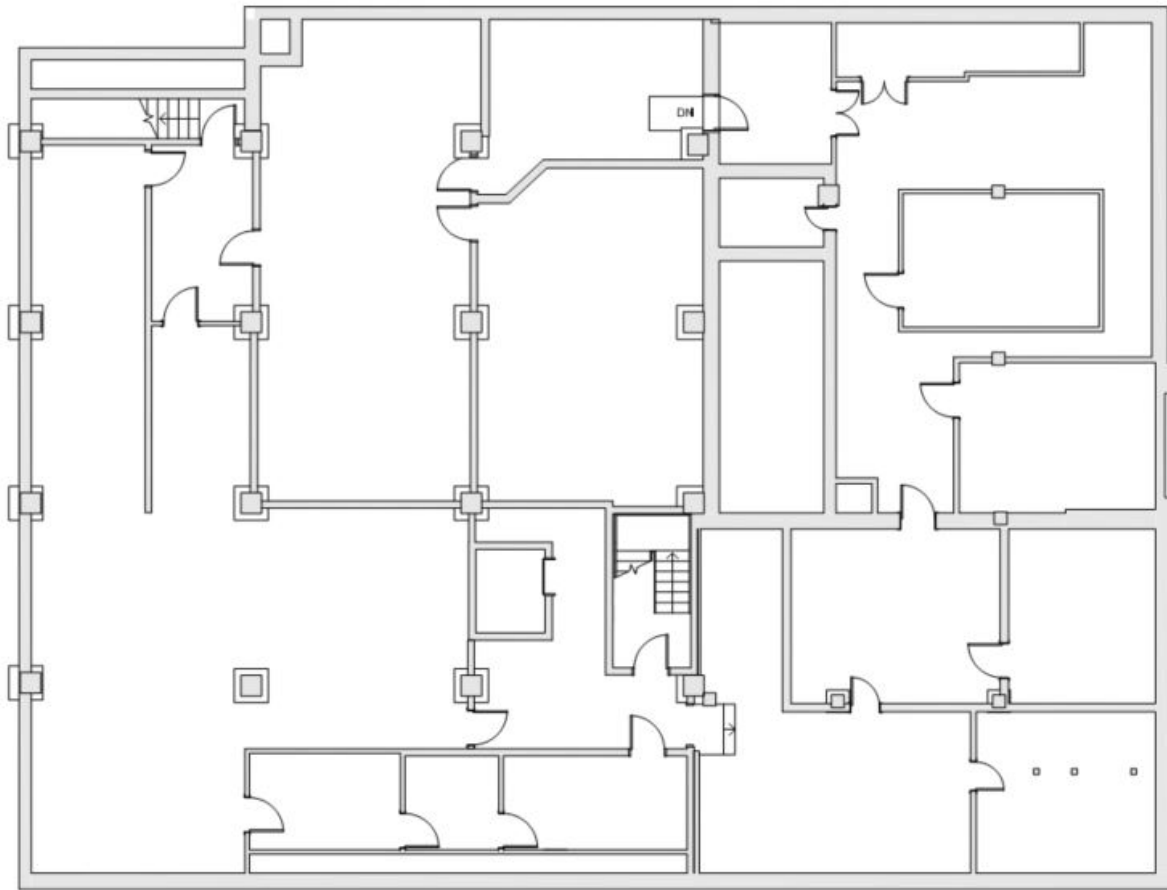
Basement Level Photographic Key Plan. Alley Poyner Macchietto Architecture, Omaha, Nebraska, 2021
